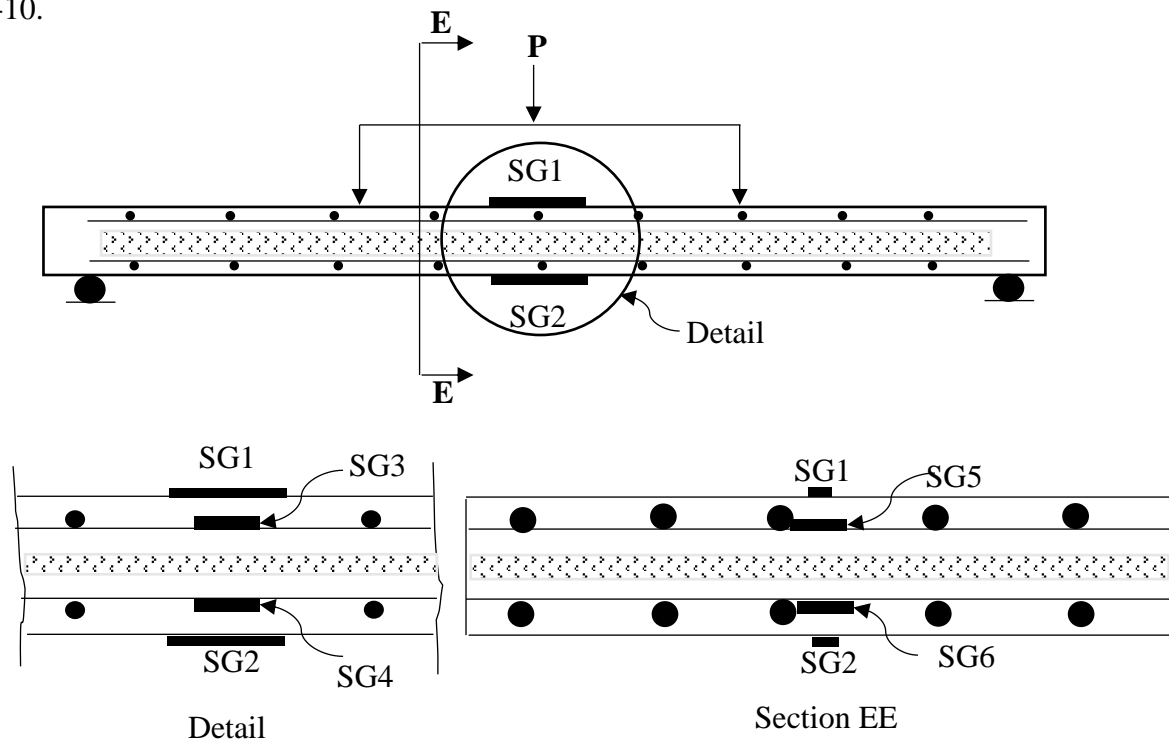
Instrumentation: Arrangement of strain gauges on concrete surface and reinforcement
